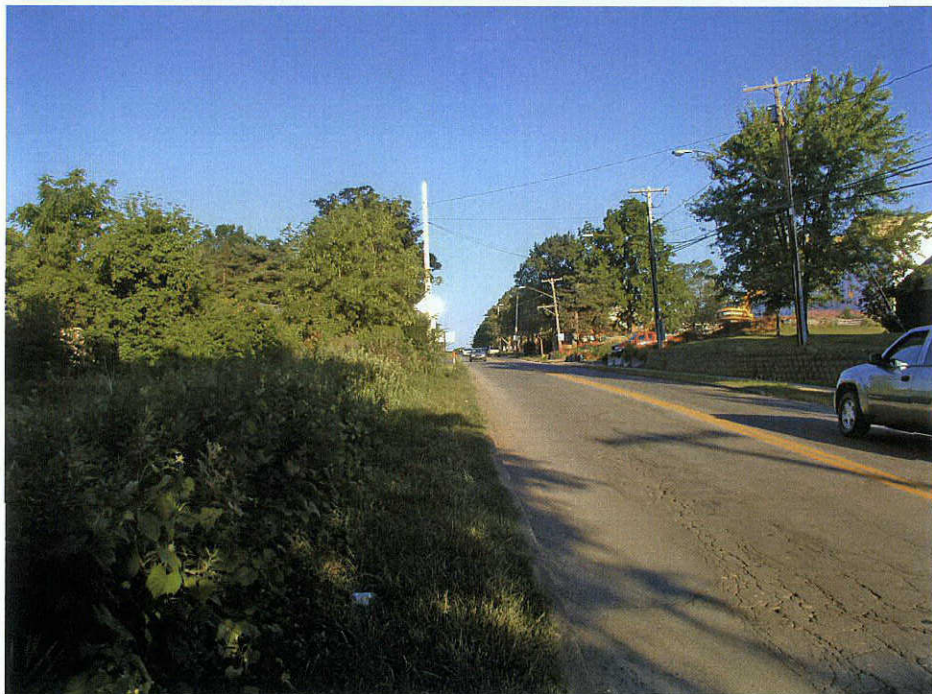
View of general project area from northeast corner of APE, facing southwest.
